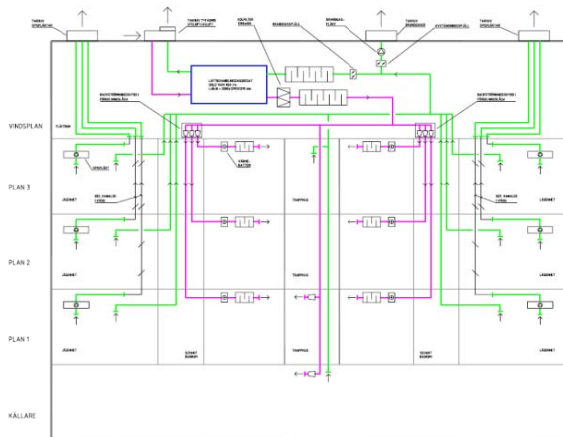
Designed ventilation system for the buildings with central ventilation, building E and F.
